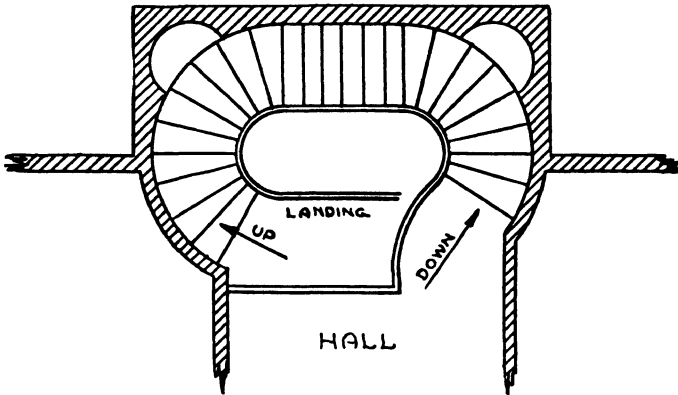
Plan of Circular Stair with Continuous Handrail and without Newels
